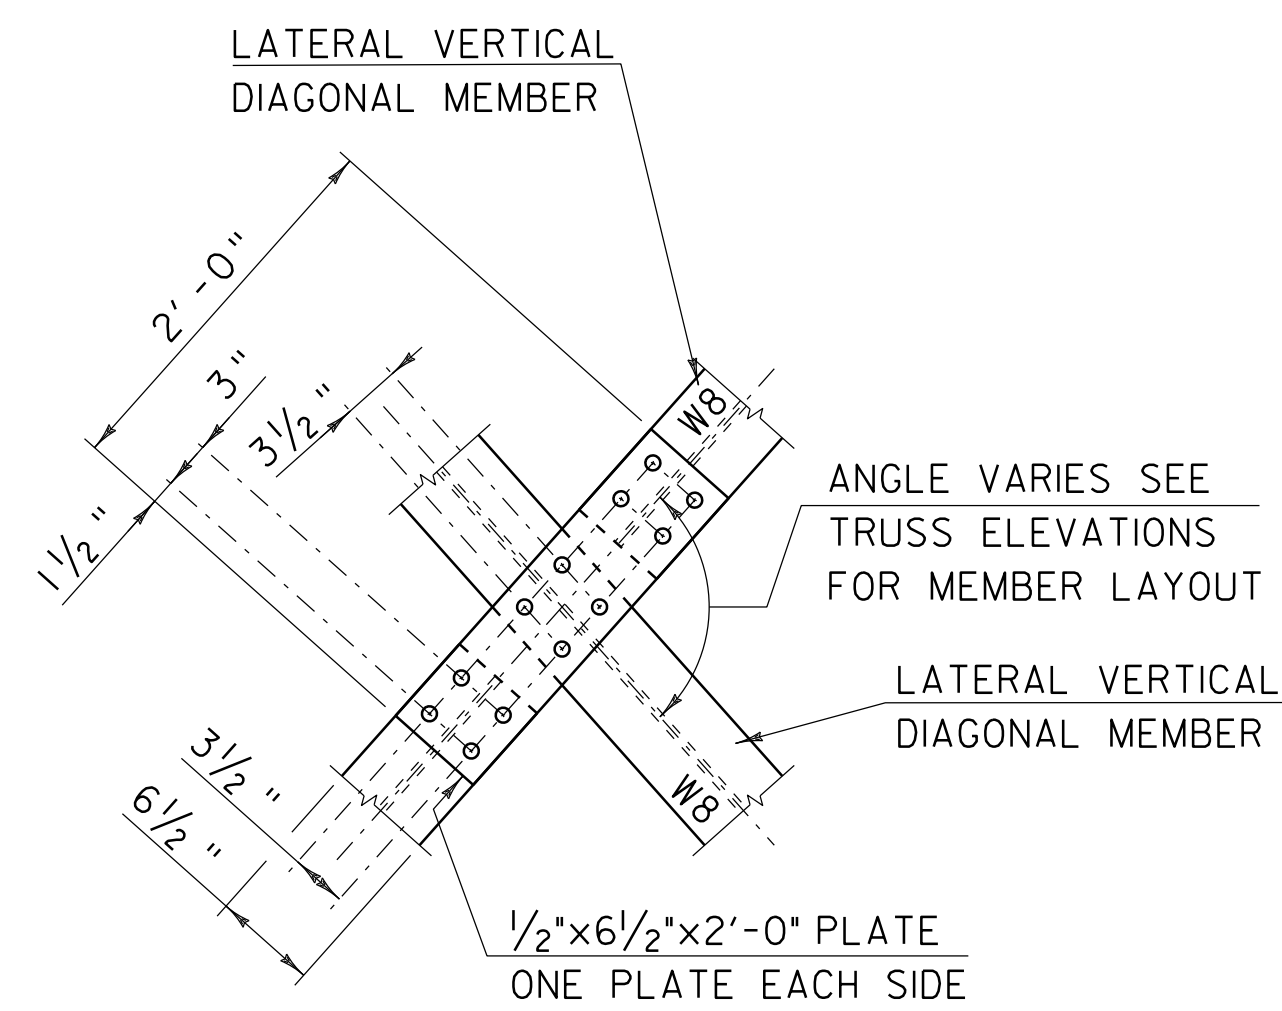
PLATE DIMENSIONS SHOWN MAY BE ADJUSTED BY FABRICATOR TO ACHIEVE PROPER FIT AND CLEARANCE AS REQUIRED.
